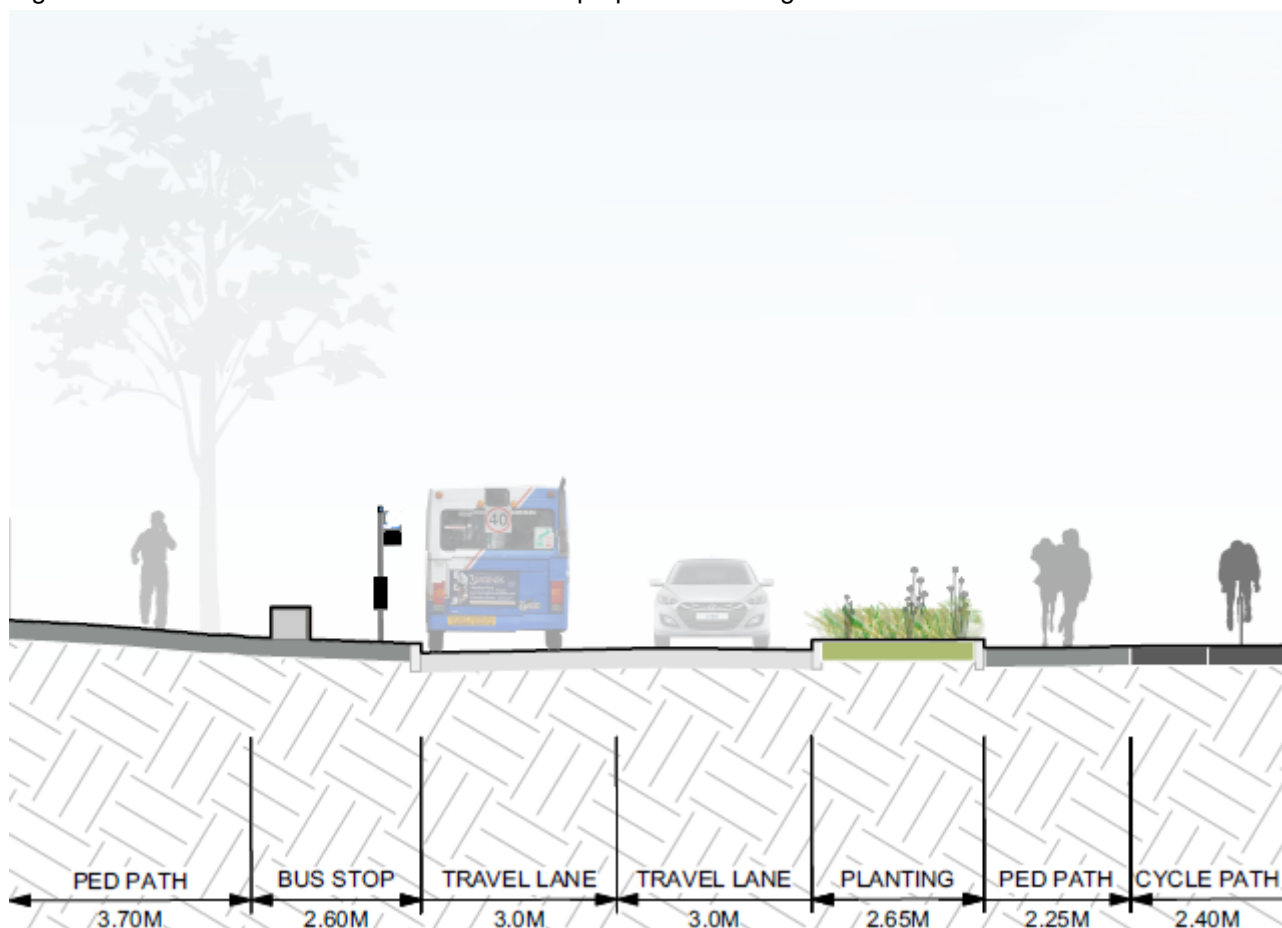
Cross section – Alfred Street South, south of proposed crossing
